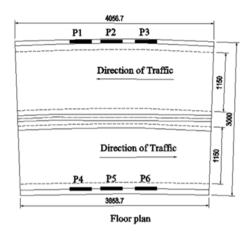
Precast self-healing concrete slab using in the tunnel (Wang et al., 2019).
